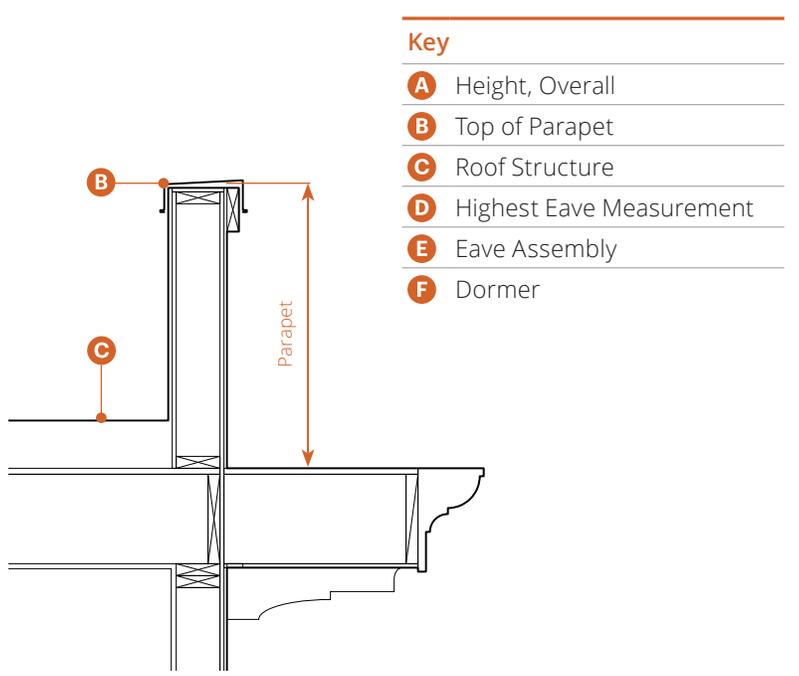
Section Detail of Top of Parapet and Flat Roof
